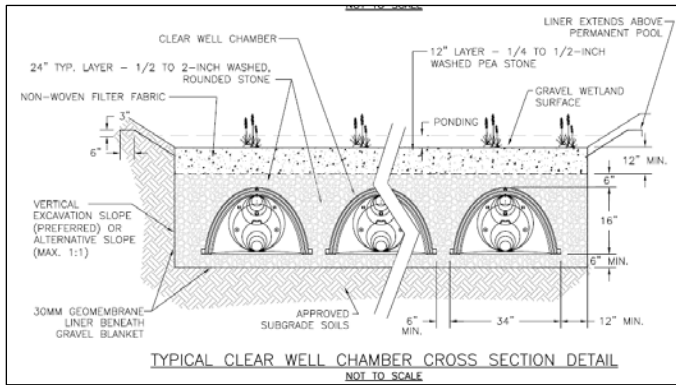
Typical cross section of gravel wetland showing underground storage chambers and vegetated surface where water pushed up from below is designed to pond.
